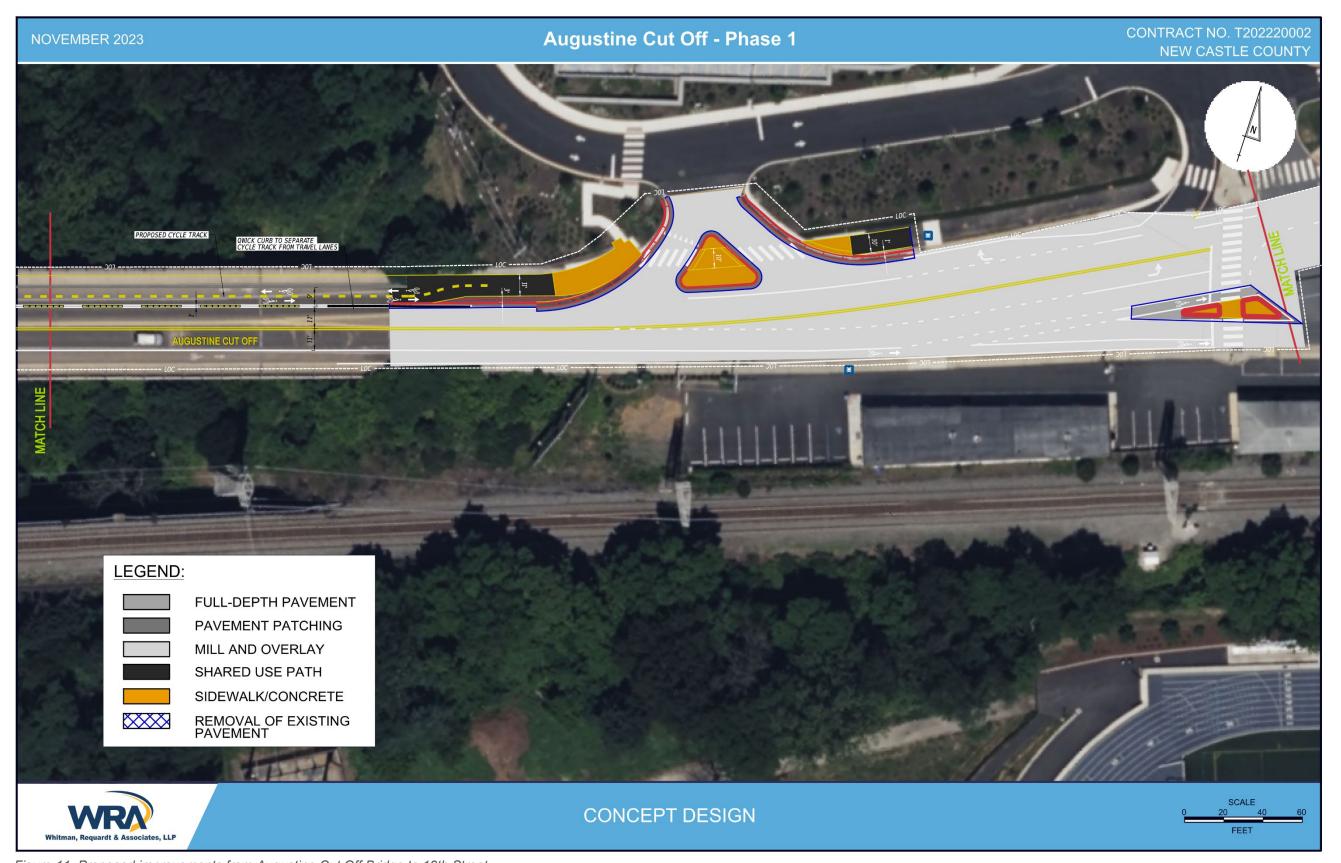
Proposed improvements from Augustine Cut Off Bridge to 18th Street
